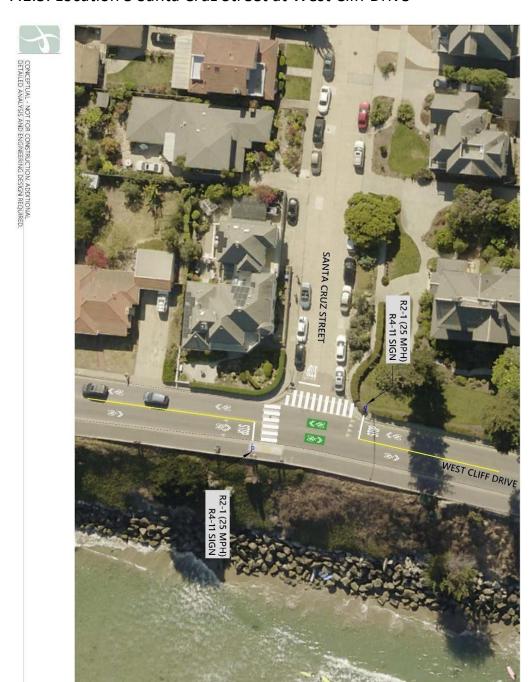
Plan view of Alternative 1 Enhancements at Santa Cruz St and West Cliff Drive
